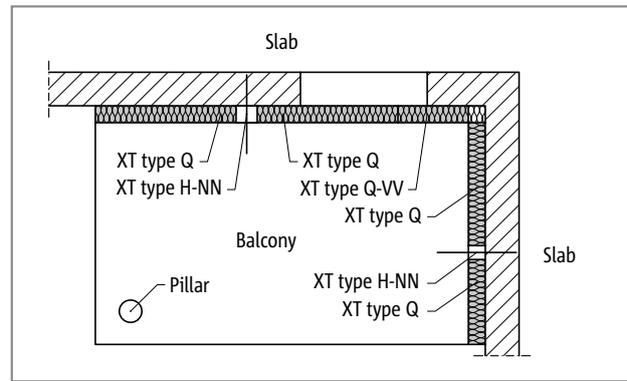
Schöck Isokorb® XT type H: Balcony supported on two sides using columns
